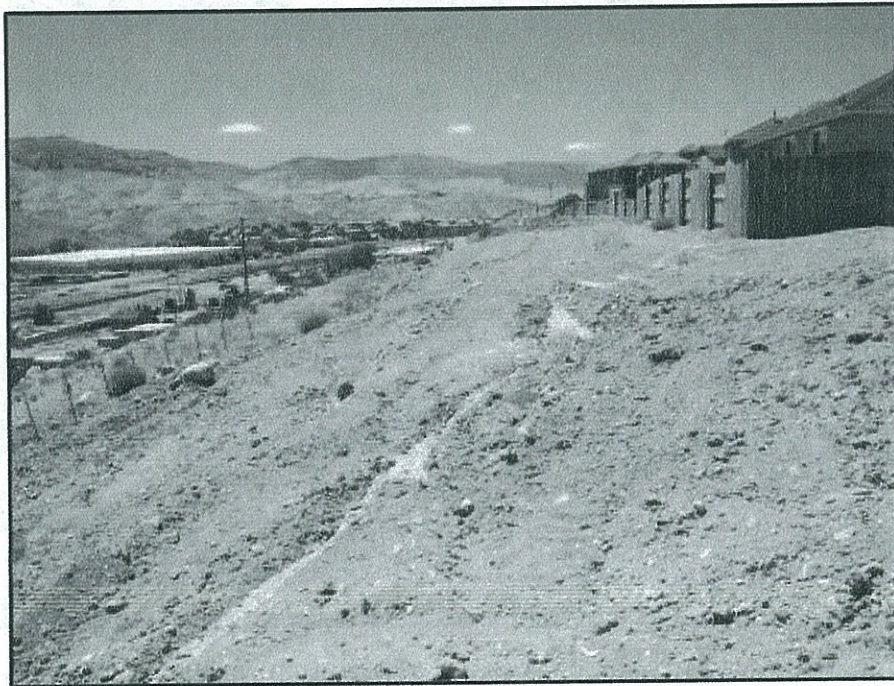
Bella Rio Construction project, City of Reno. View looking west of the south-facing slope. There is disturbed soil along slope with no BMPs to retain soil onsite along the perimeter or within the slope itself. The only downslope BMPs consisted of a wire fence and vegetation. SWMPP approved by the City for the project included a silt fence, but no silt fence was in place and the contractor had decided vegetation below the site was sufficient, but had not modified the SWPPP to reflect the change.
